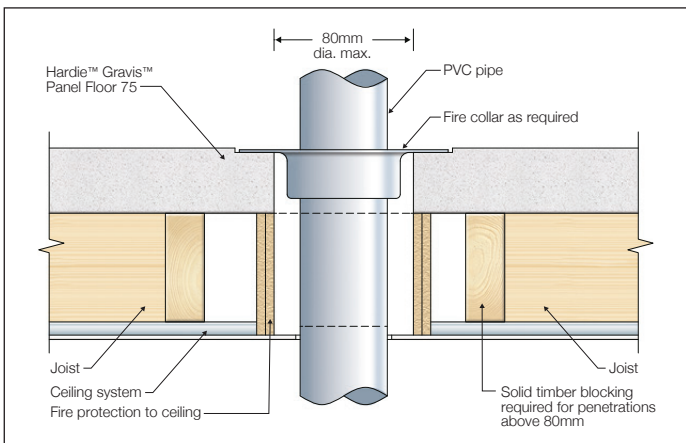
FLOOR WITH LARGE PENETRATION AND BLOCKING
